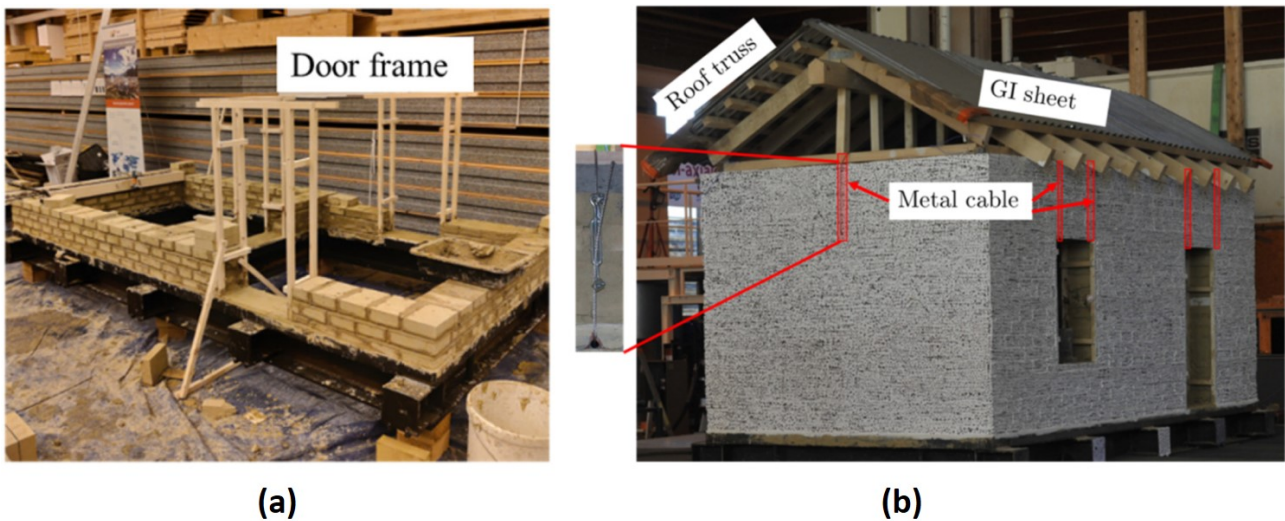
The tested masonry house [31]: (a) house construction; (b) the roof truss and its connection with masonry house.
